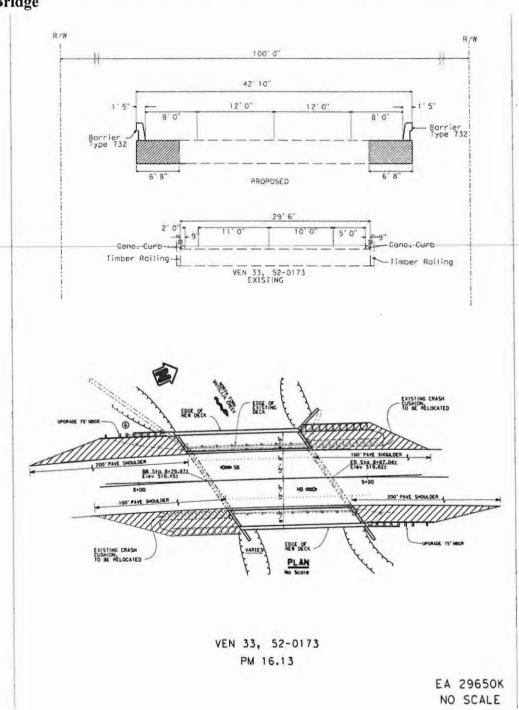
Design Concept proposed for Location 1 - Route 33 (PM) 16.13 at Matilija Bridge
